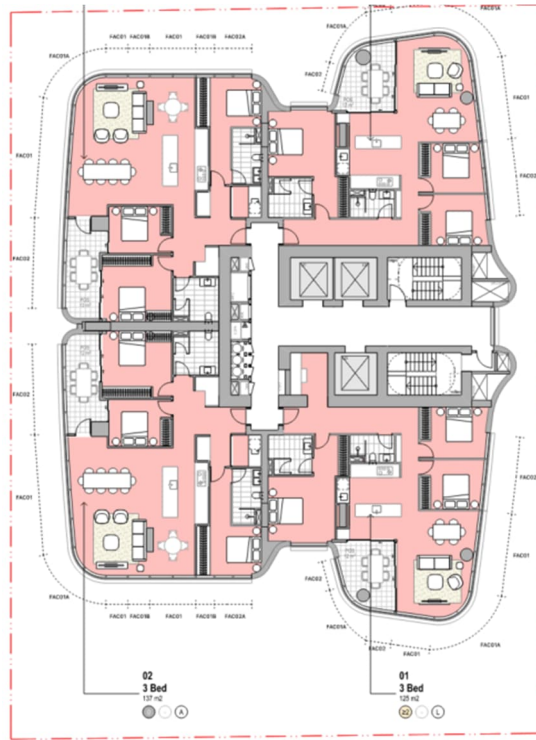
Level 36 – 37 Tower - Penthouse Residential Plan
